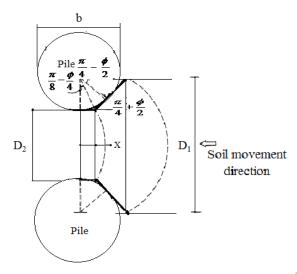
Plastic deformation of ground around stabilizing piles [14]
